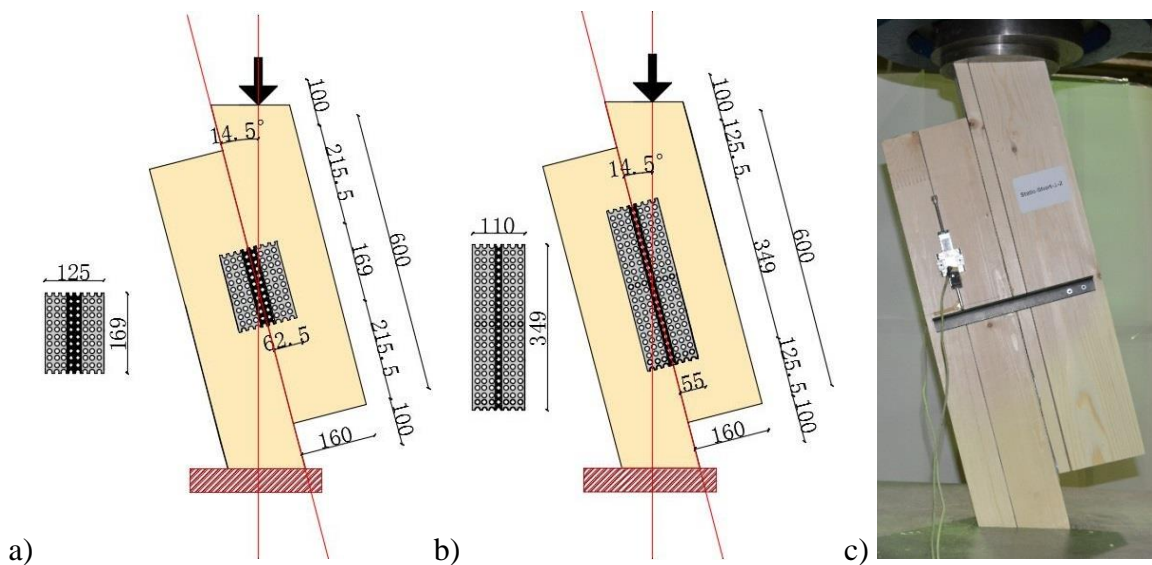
Static test setup: a) short plates; b) long plates; c) Photograph of a static test
